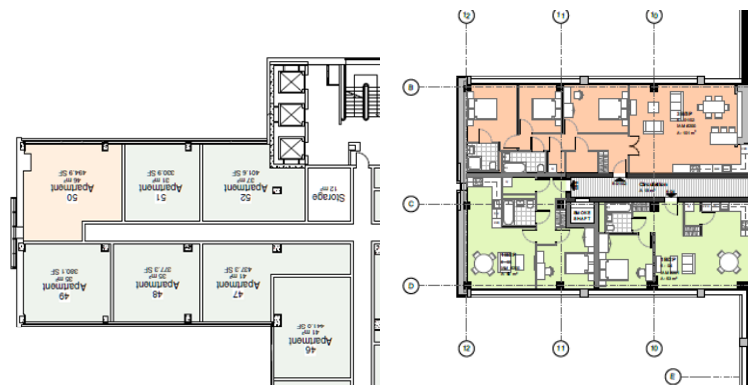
Left – Floorplan approved under GPDO 2015 application (note limited details needed for GPDO) Right – Floorplan approved under 2016 planning permission
